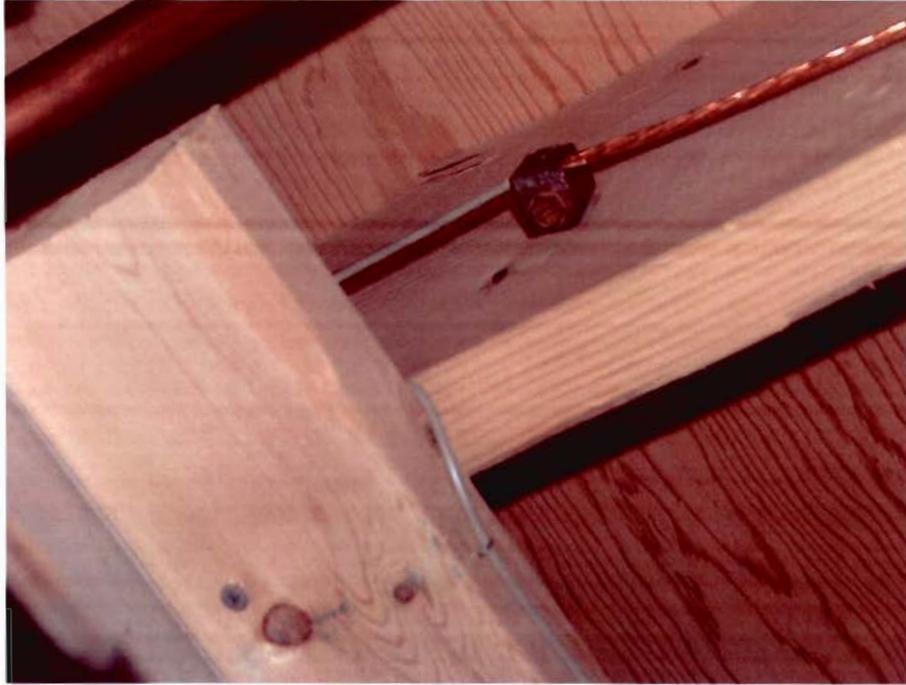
Brook Ln. FiOS grounded to electric ground.
